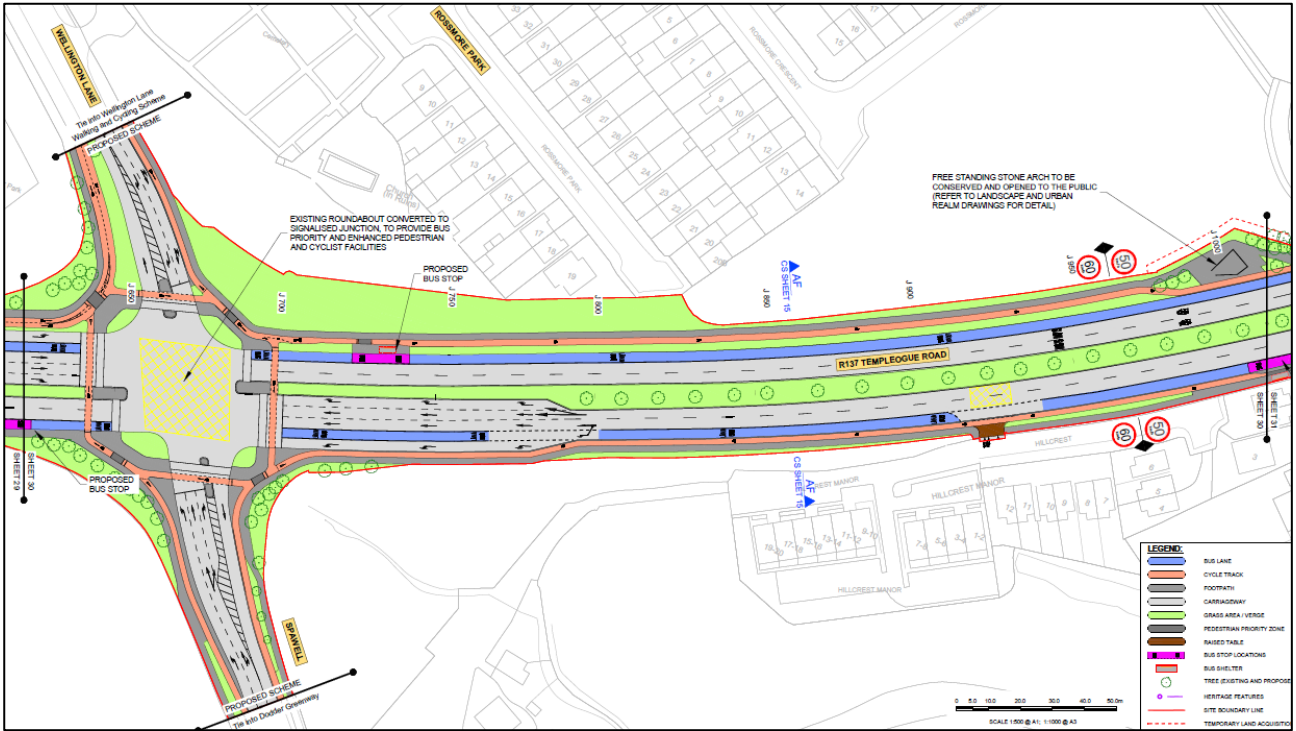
Extract from General Arrangement Drawings (Sheet 30)
